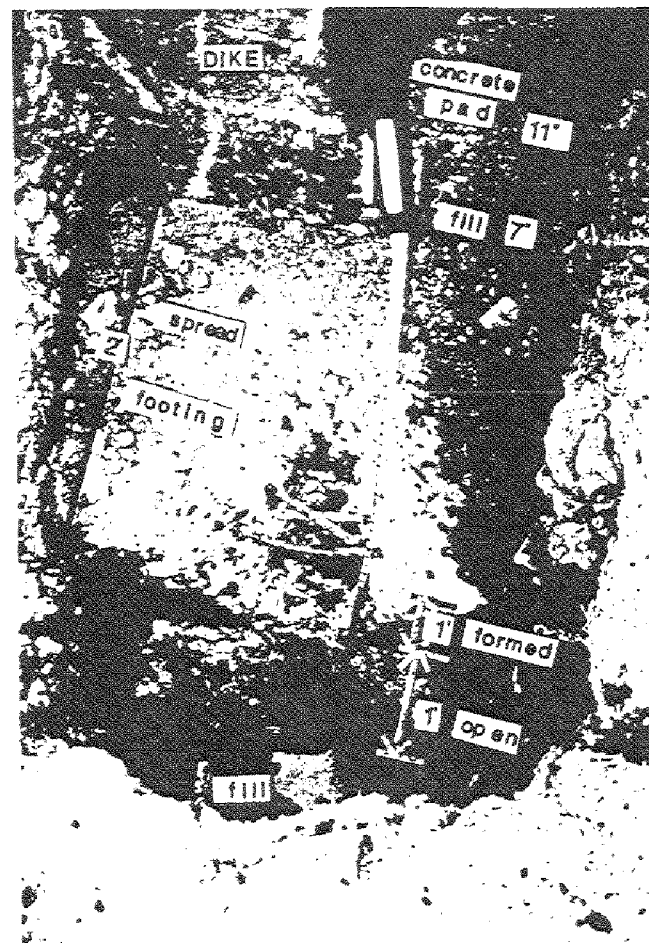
Test pit profile. A concrete pad and fill overlie a 2 foot wide and 2 foot deep spread footing.
